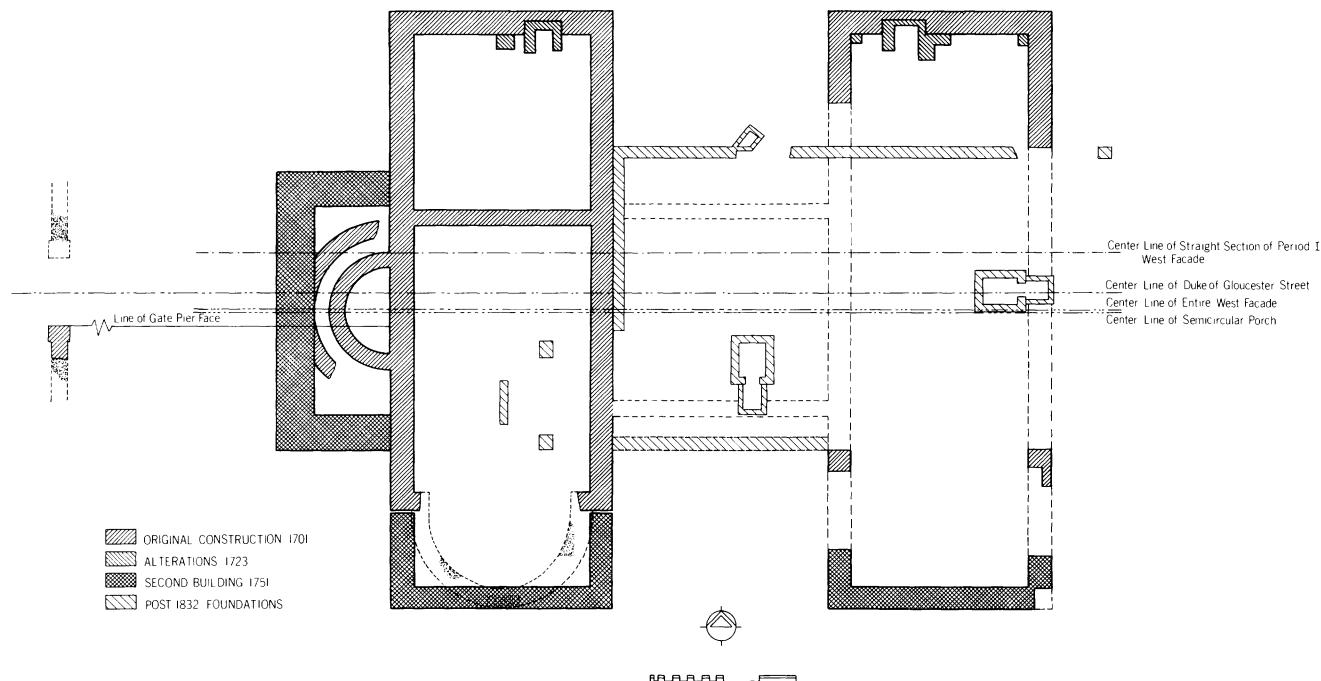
Plan of capitol foundations (author, after drawing by John Zaharov, 1930).
